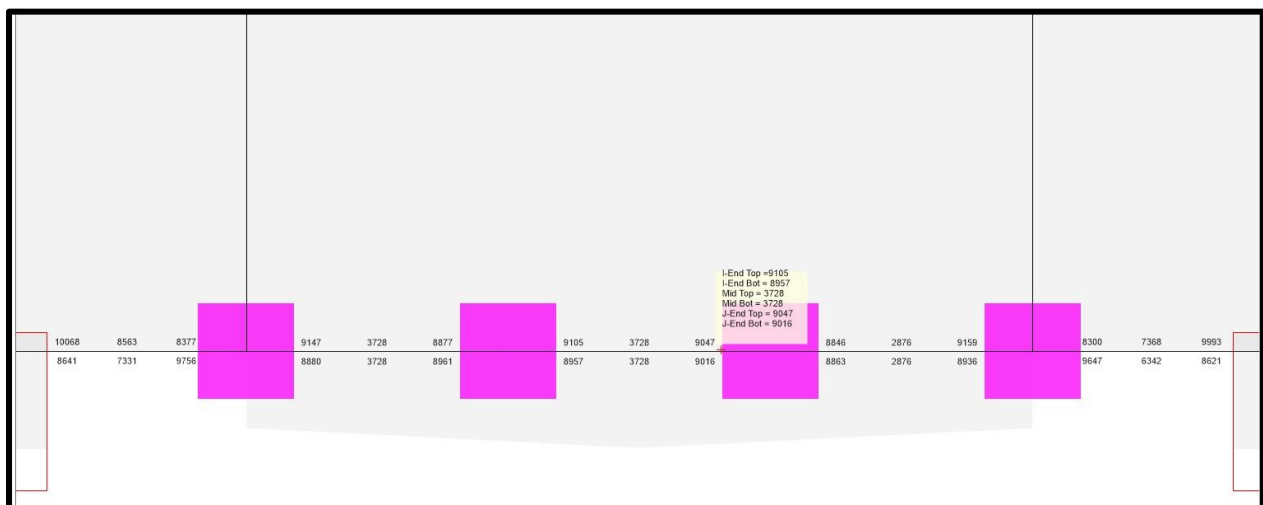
Edge Beam Flexural Longitudinal Reinforcement
